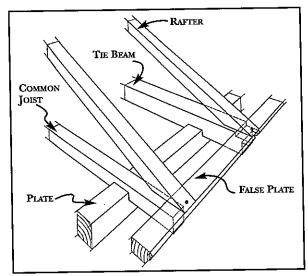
Eaves detail of the first-period section of the house. The false plate is fitted into the large tie beam, but simply sits on top of the common joists. The false plate is beveled on its outer face to receive an exterior crown molding. Drawing by Willie Graham, 1999.
